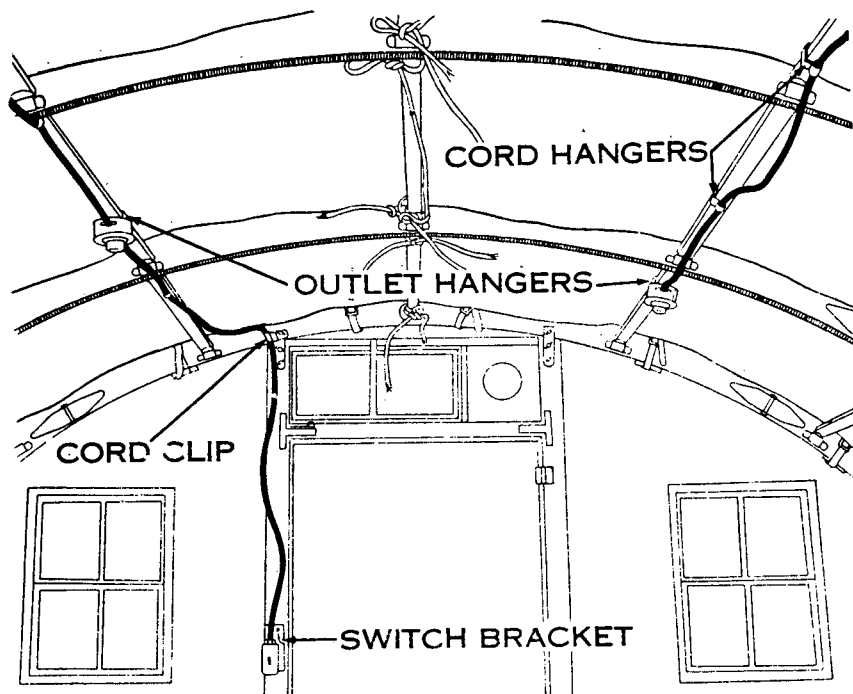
Attaching electrical outlet and switch assembly to the inside of tent, frame-type, insulated, sectional.
